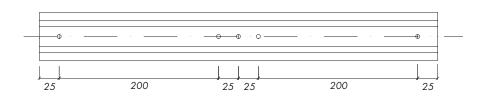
Top view of Click Roll Cap Fastener with hole pattern
